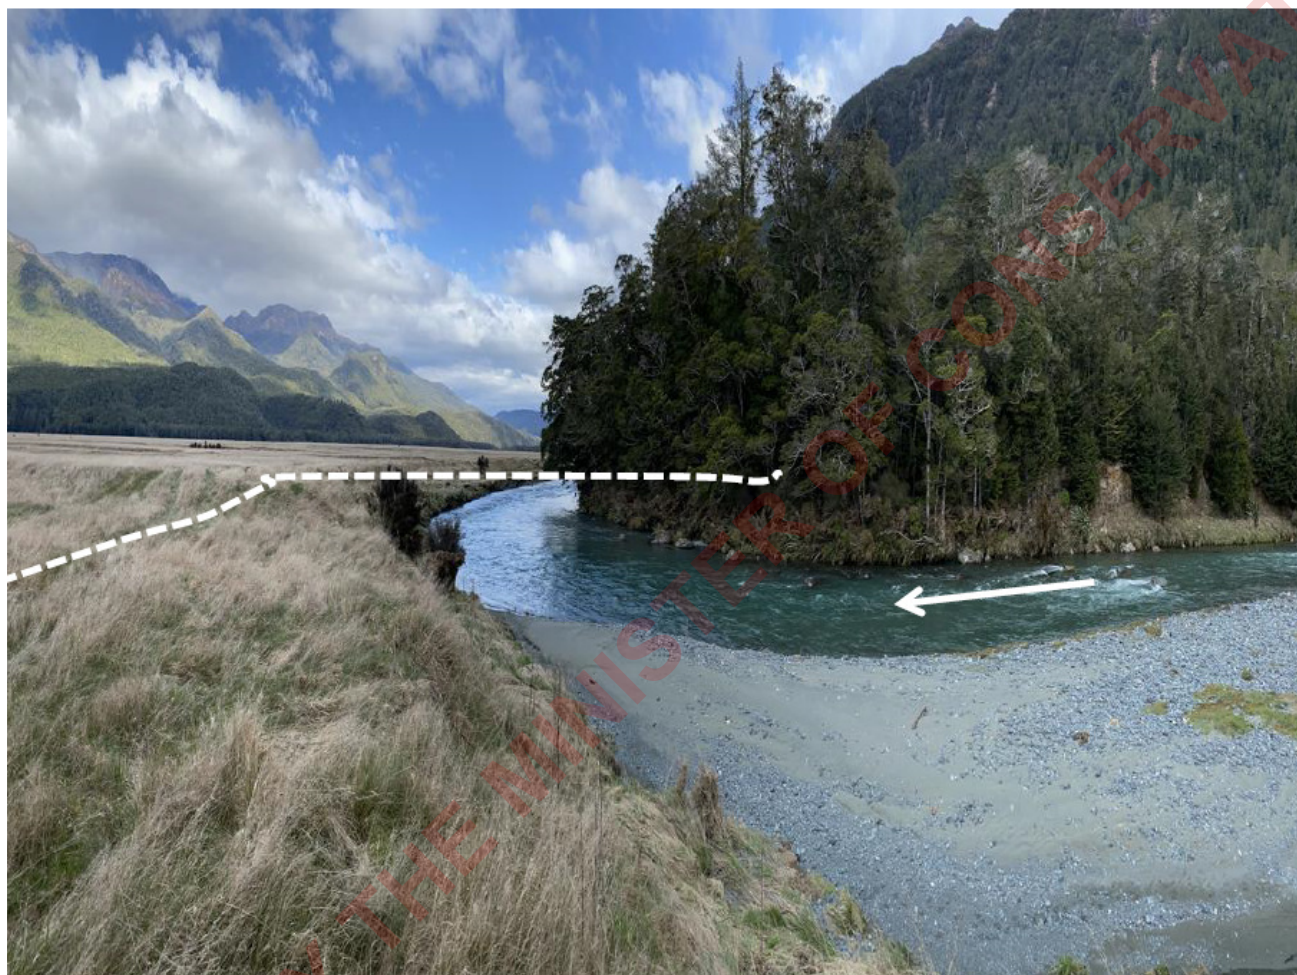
Proposed site for the Upper Upokororo Eglinton Suspension Bridge (Source: Southern Land Report)
